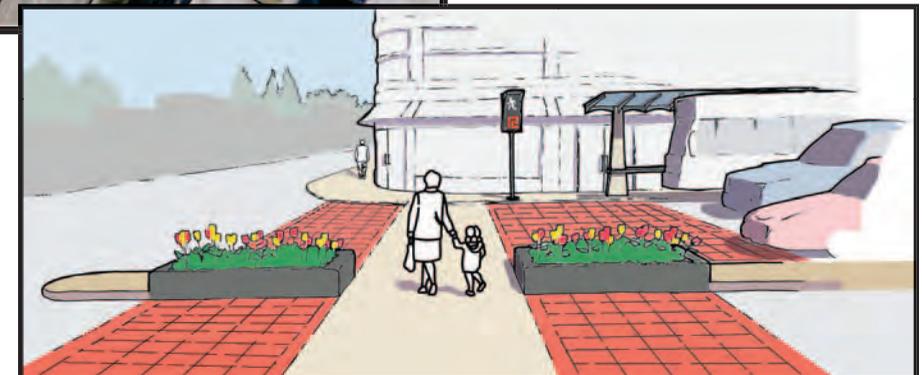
Illustrative plan drawing for reconstructing the sidewalk and streetscape in the Harlem and Waukegan District. Related sketches show how a consistent sidewalk and new lane for parallel parking can be accommodated, and illustrate the recommended streetscape concept which includes decorative pedestrian level street lamps and new highway lights.
